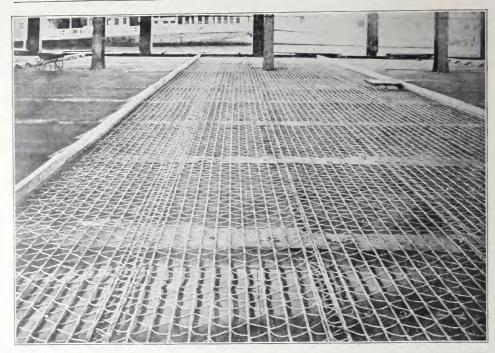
Absolute minimum cost of installation resulted from the use of Triangle Mesh Reinforcement in Pier 42, North River, New York City. Notice how this heavy 3-strand fabric stays in correct position.
